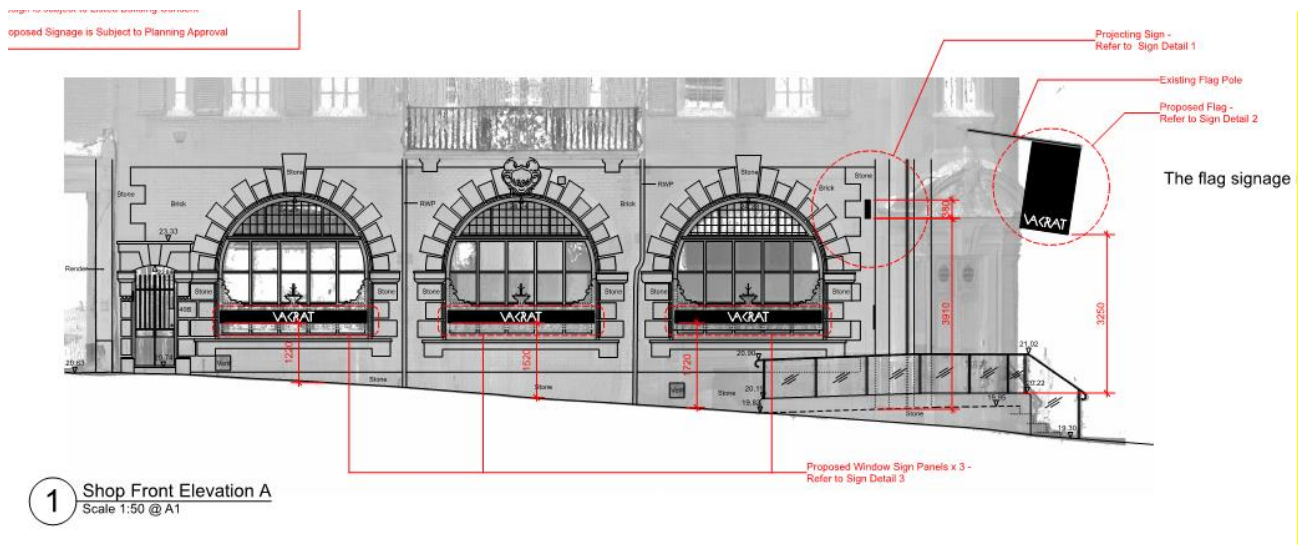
(above): Proposed shop front elevation A (source: submitted drawings)
